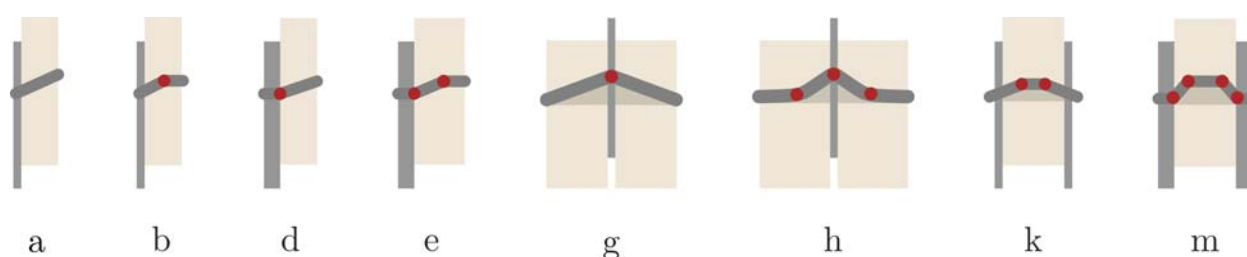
Failure modes for steel-to-timber connections with fastener deformation (adapted from EN 1995-1-1 (2004)).
